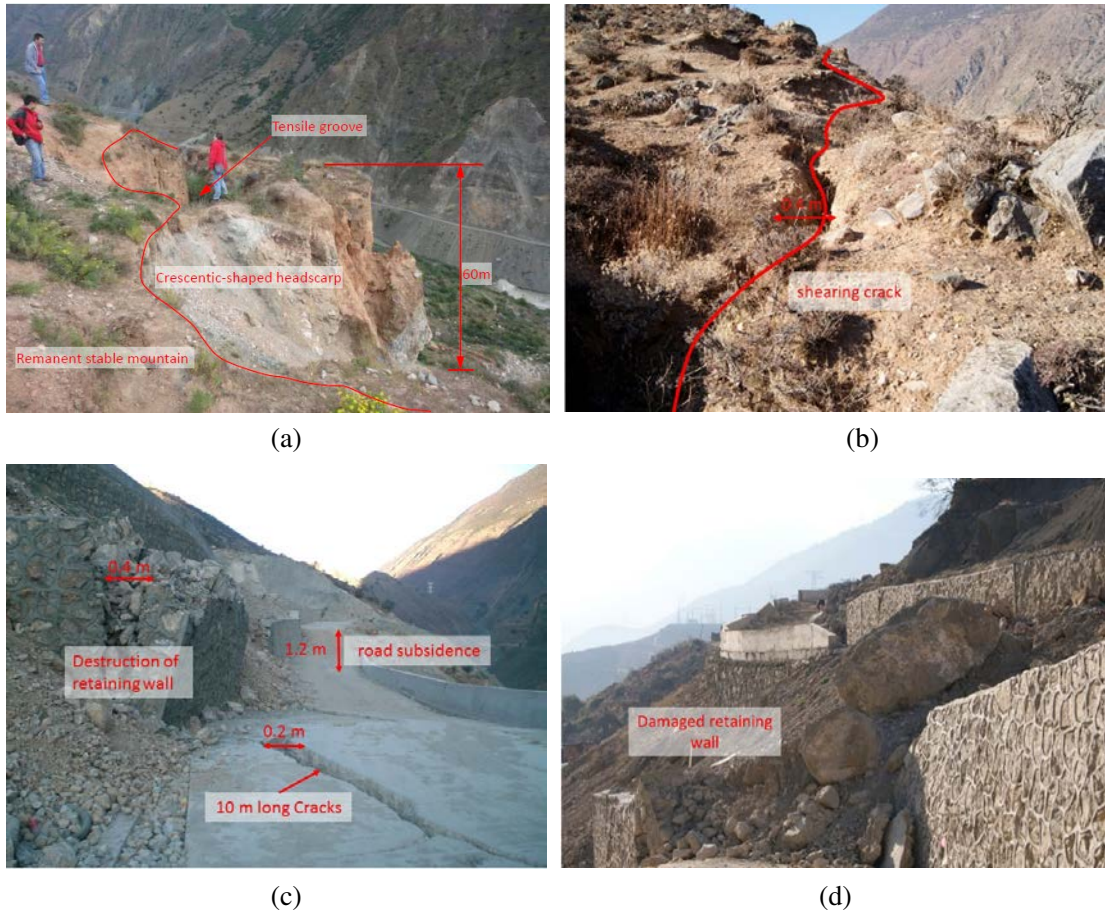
Deformation evidence: (a) 60 m Headscarp of the DRL, viewing north; (b) 380 m long and 0.1 - 0.4 m wide twisty right shearing crack of the DRL mainly cut through the soil; (c) damage of retaining wall and ancillary road pavement; (d) subgrade failure of the ancillary road.
